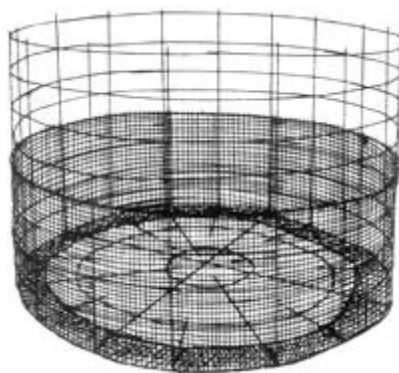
Skeletal cage for ferrocement tank construction (*CSE undated*)
